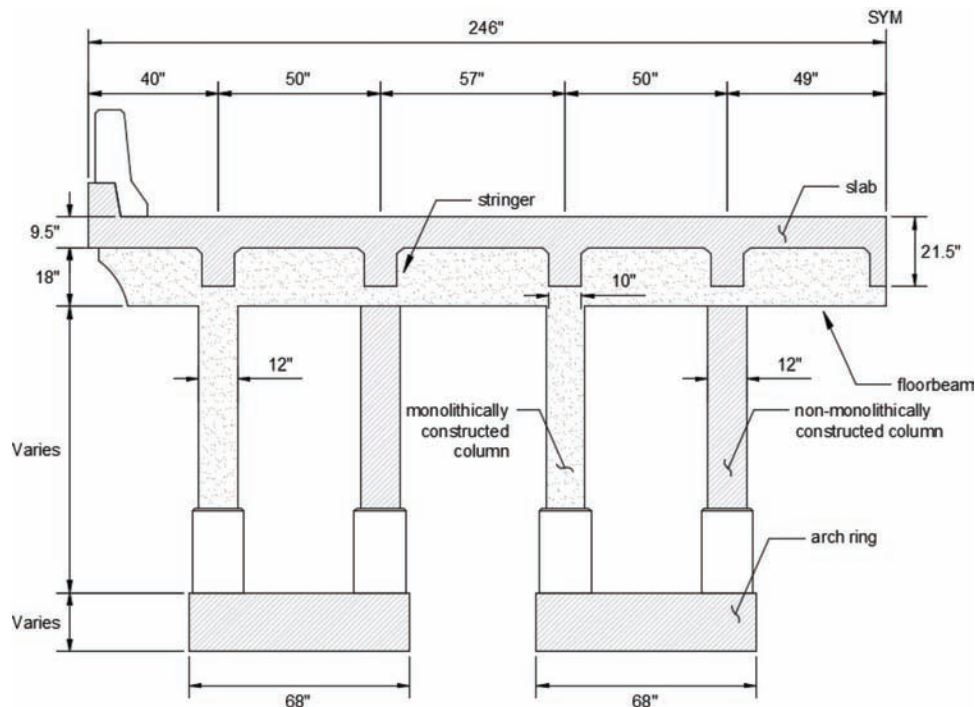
Typical cross-section of the Roaring Creek Bridge.
